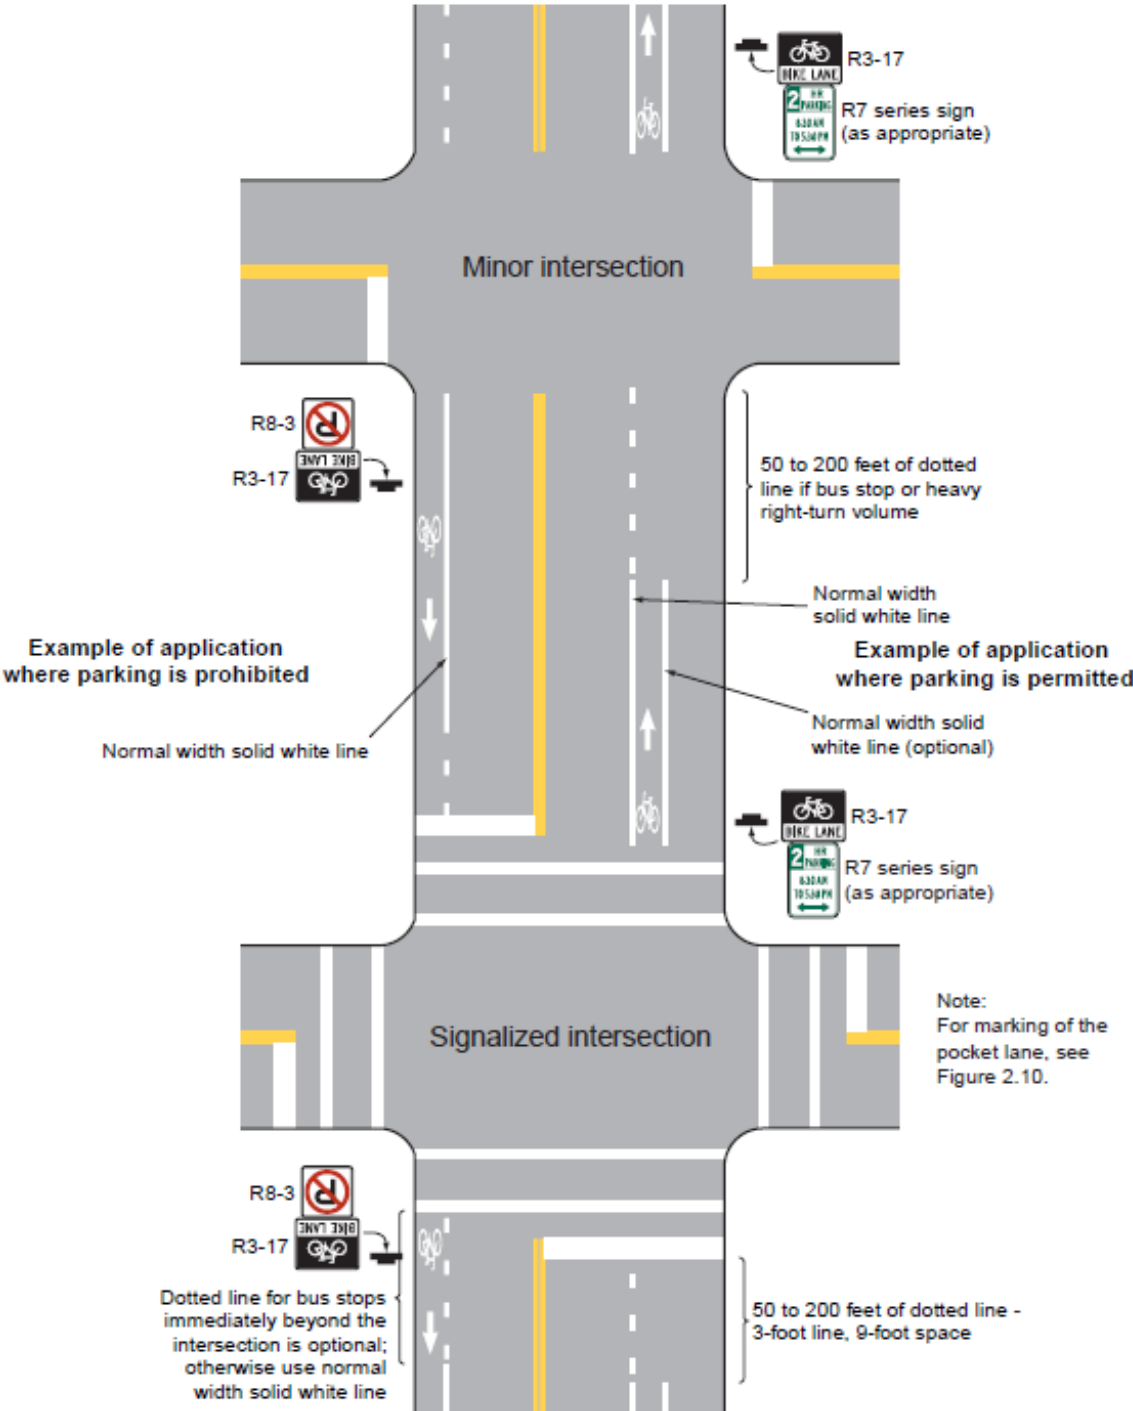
Examples of Intersection Pavement Markings -- Designated Bicycle Lane with Left-Turn Area, Heavy Turn Volumes, Parking, One-Way Traffic, or Divided Highway
